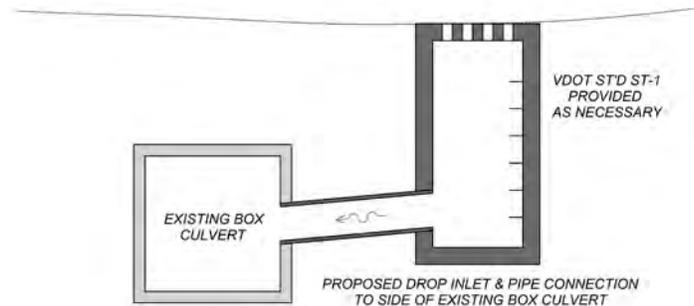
Proposed Storm Pipe Connection to an Existing Box Culvert
